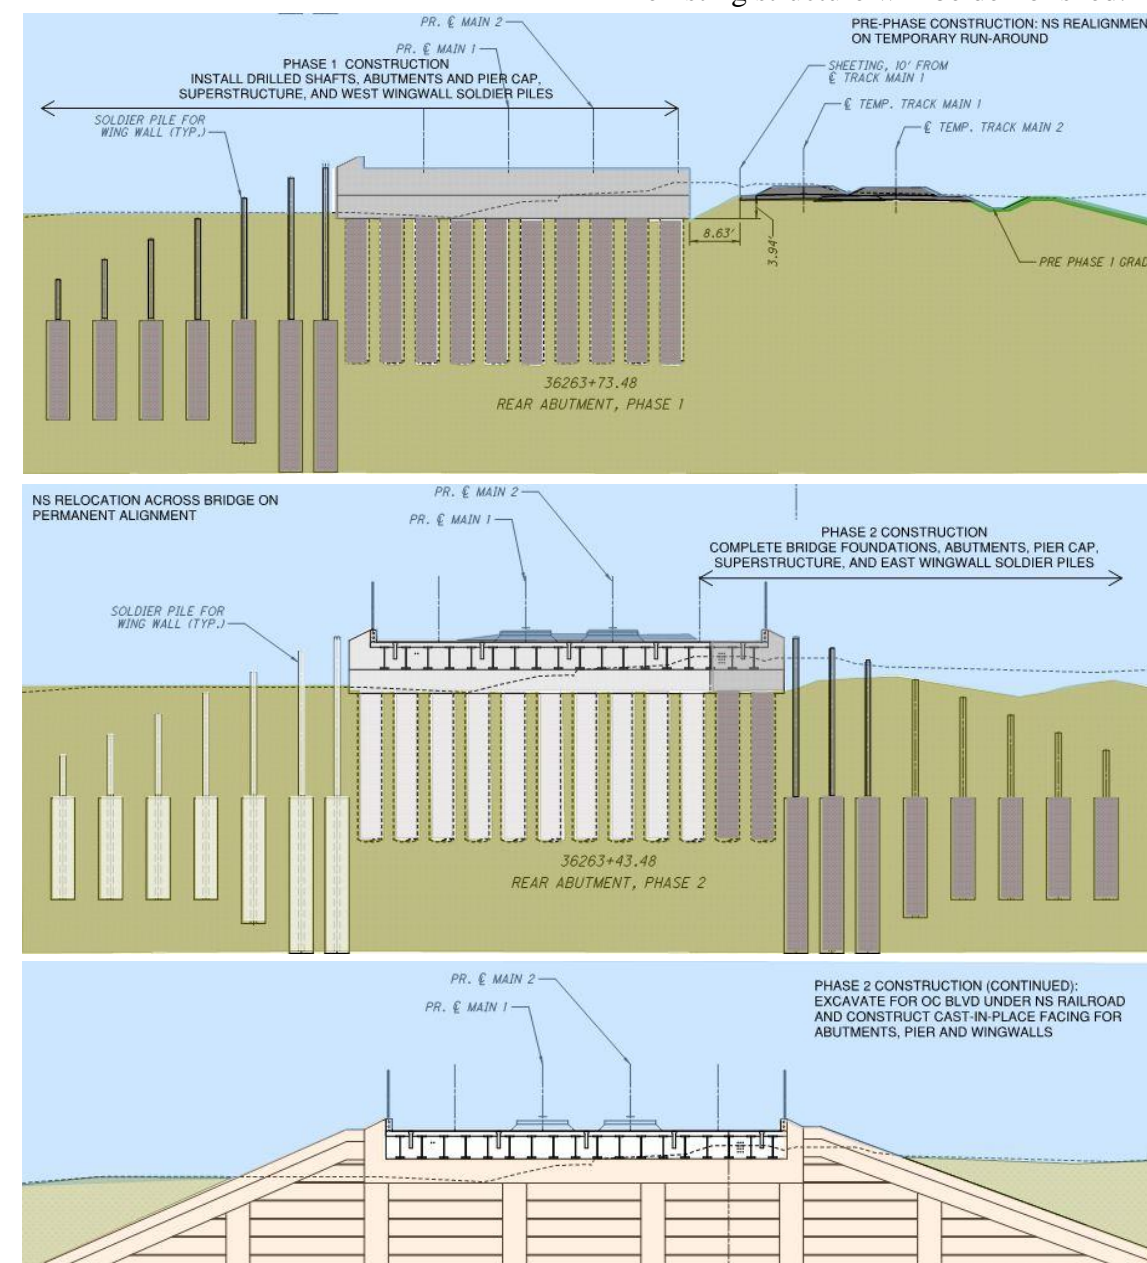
Phased Construction using Top-Down Construction with NS on Temporary Run-Around
